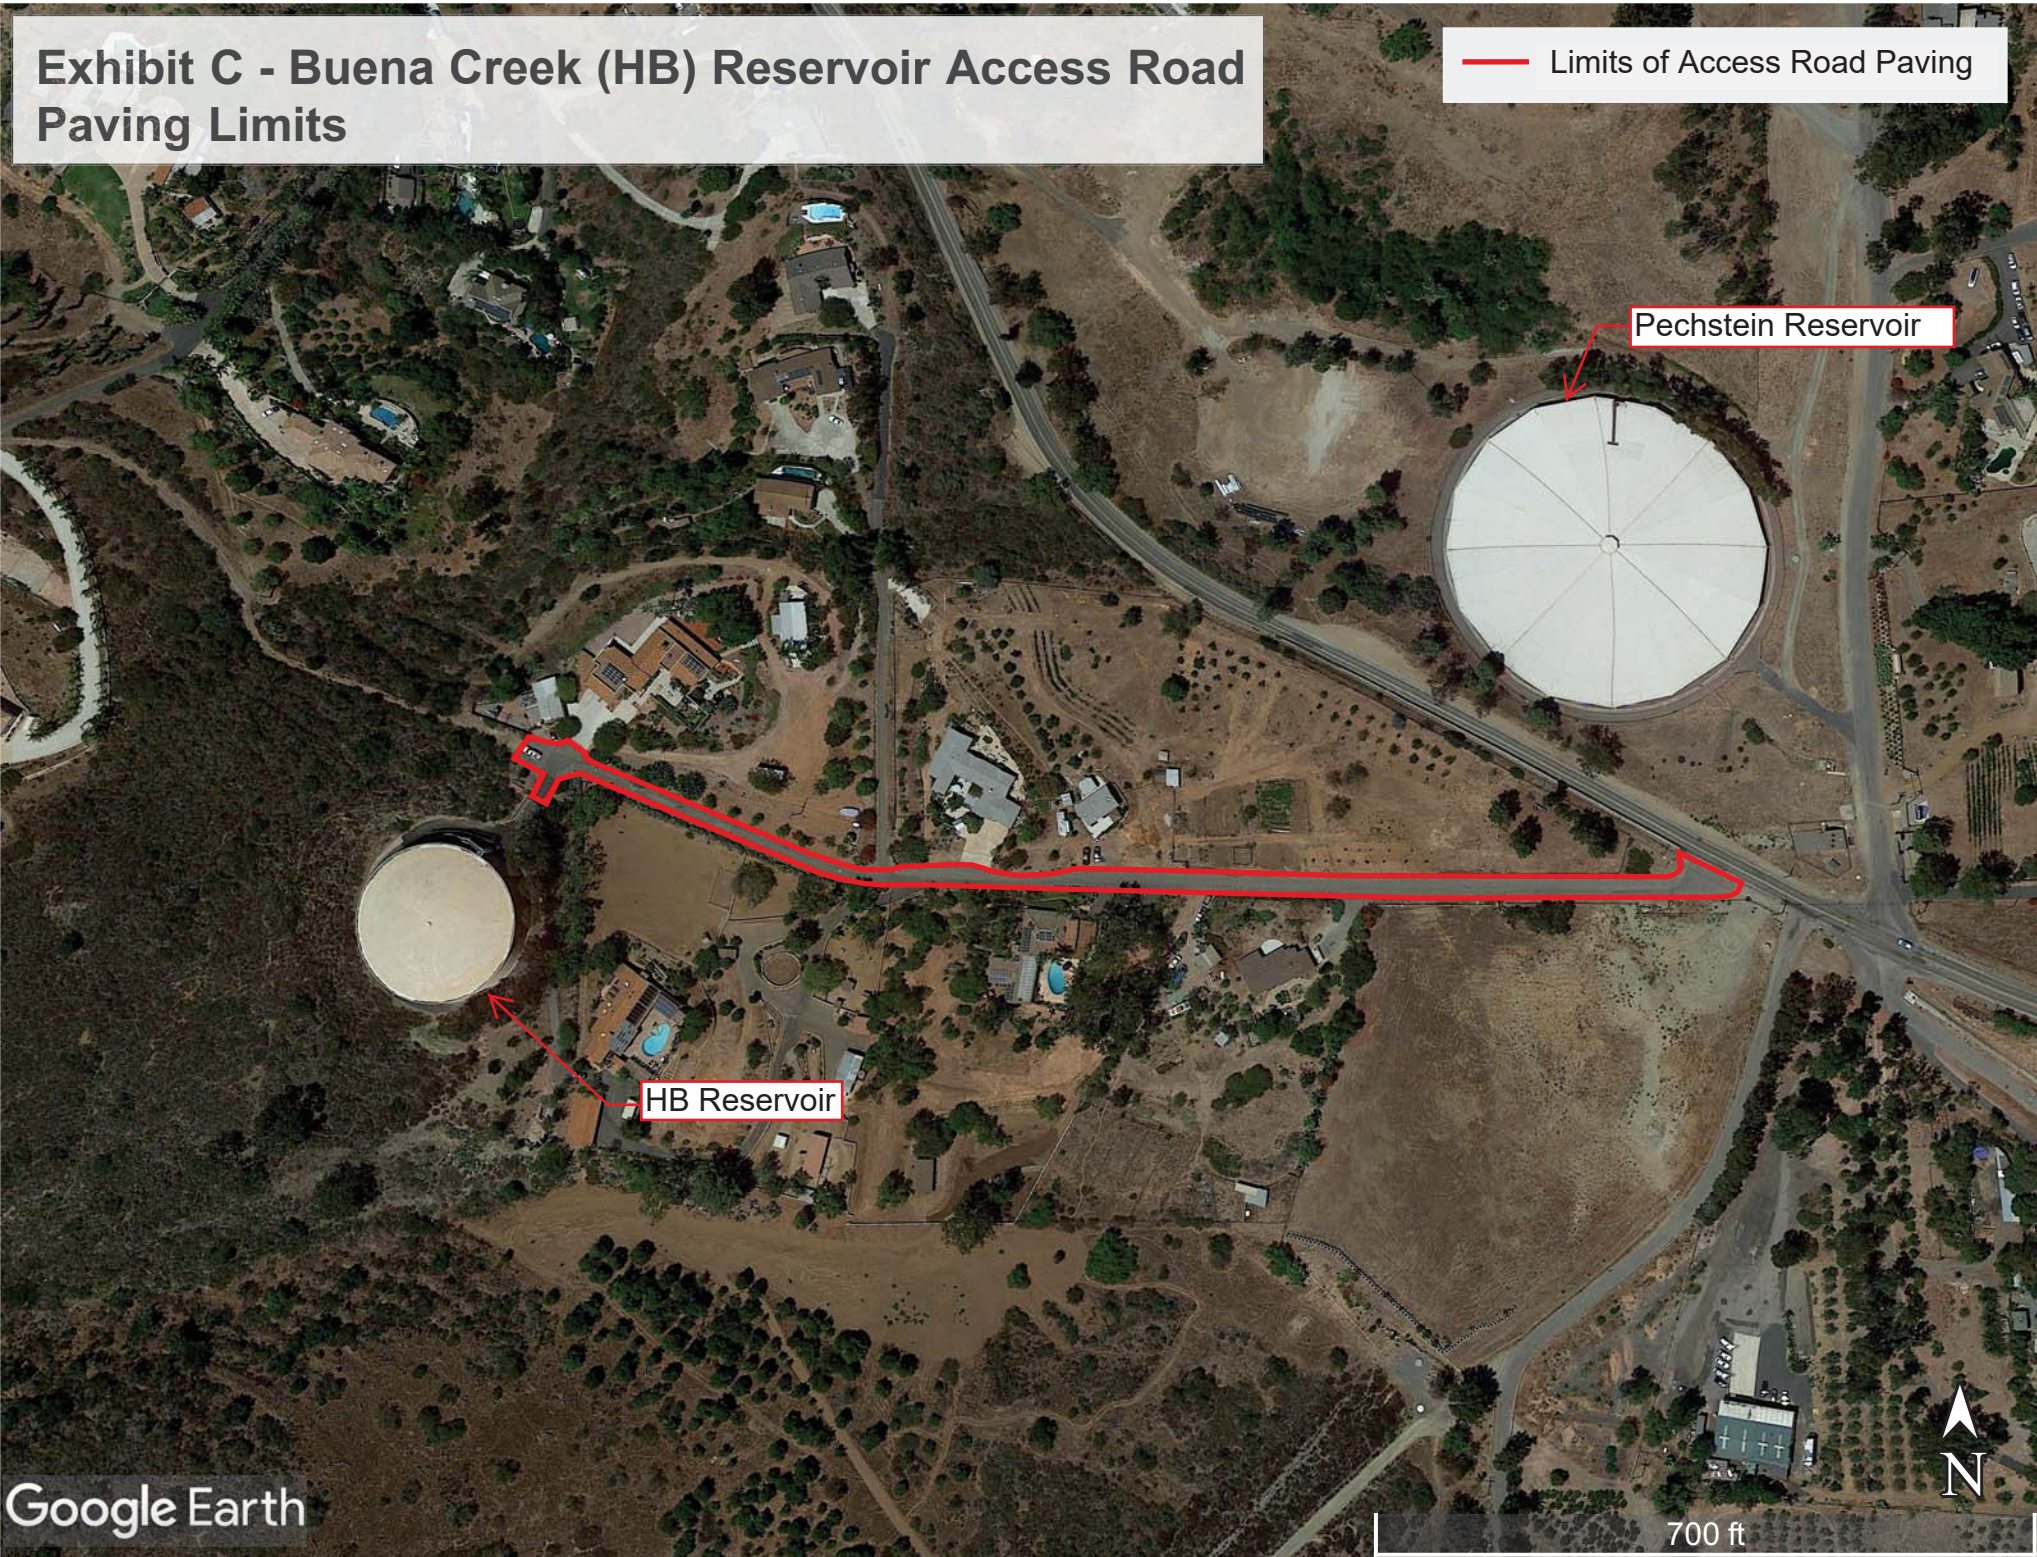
# Exhibit C - Buena Creek (HB) Reservoir Access Road Paving Limits
